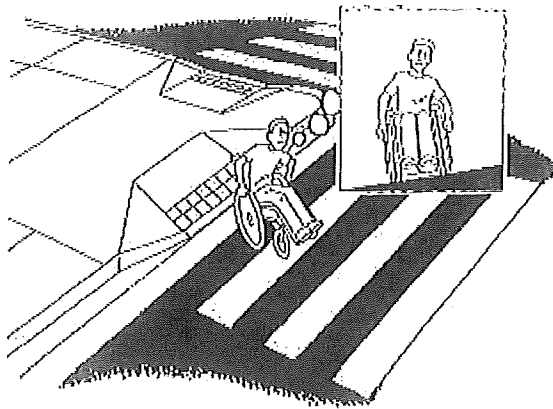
If intersections are not level, the slope of the roadway translates into a difficult cross slope for wheelchair users to travel across.
